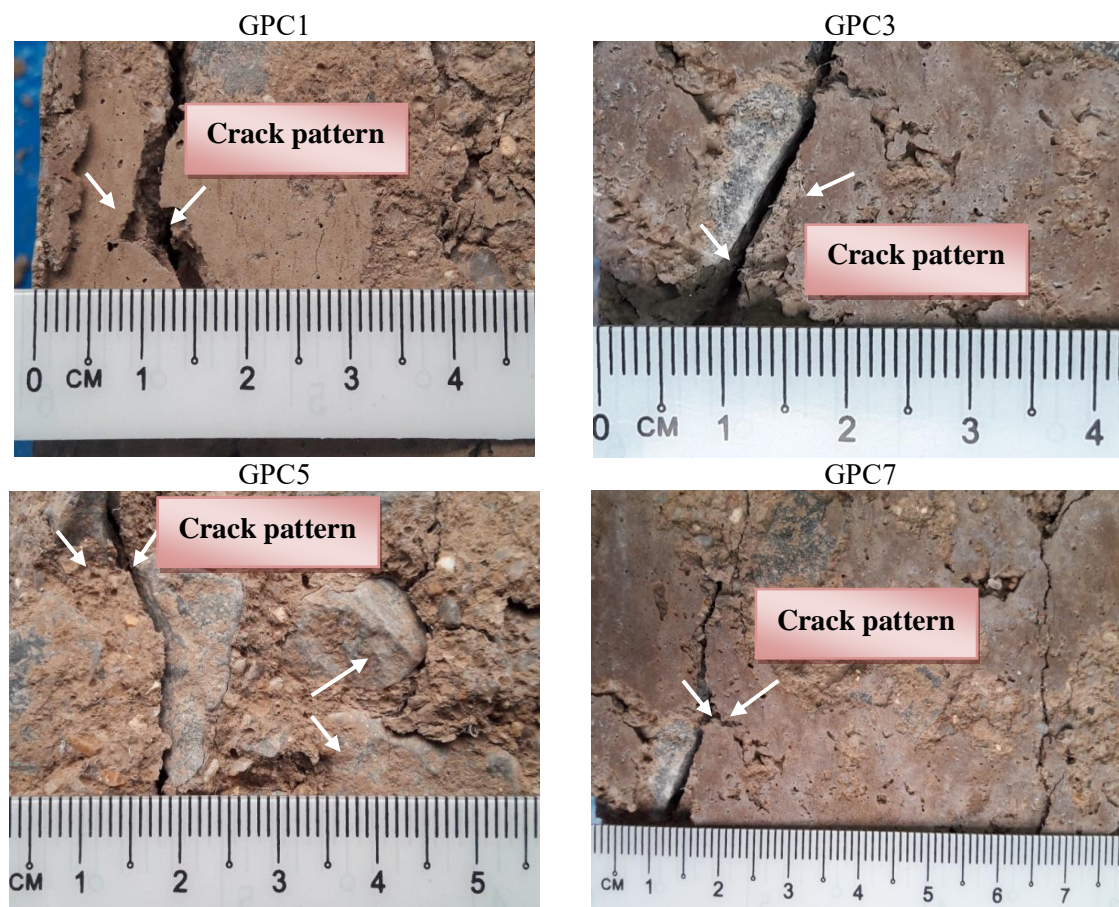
Crack patterns for geopolymer concrete structure after compressive strength testing.
